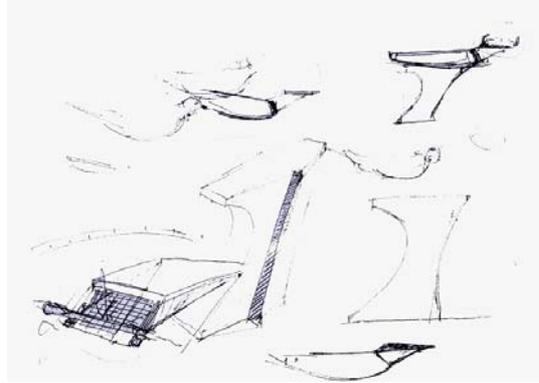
Project outlines – section of plank covering pier with zoomorphic references
